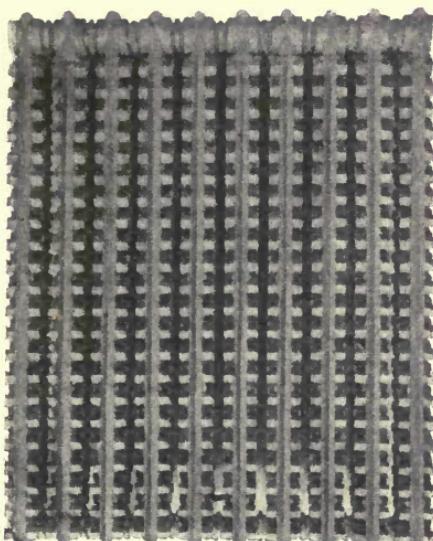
Front View of Cast-Iron Sectional Heater. The Banks of Sections are Enclosed in a Steel-Plate Casing.
